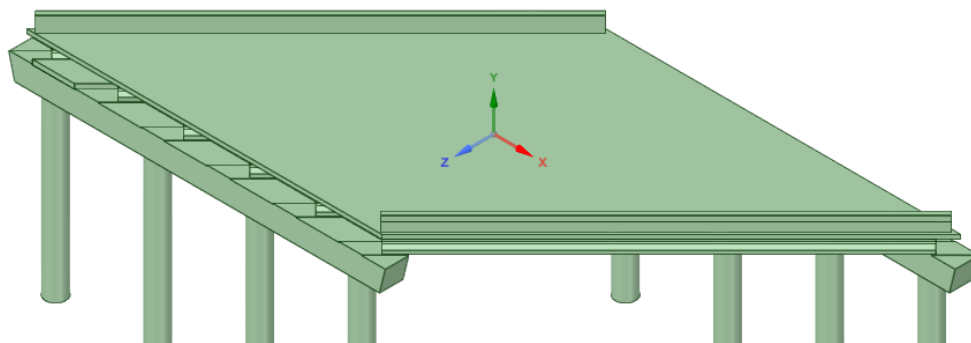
45-degree skew, 44-ft roadway TX28 I-girder bridge
